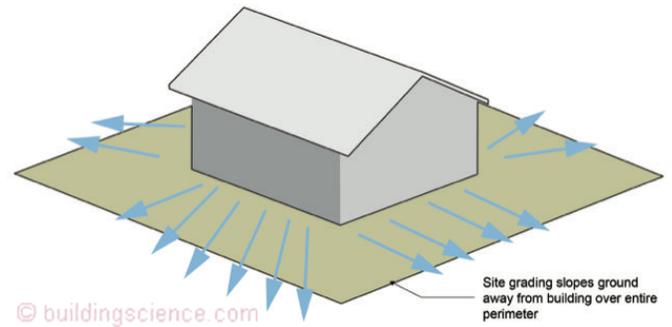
Site Drainage - Drain the water away from you building perimeter.
